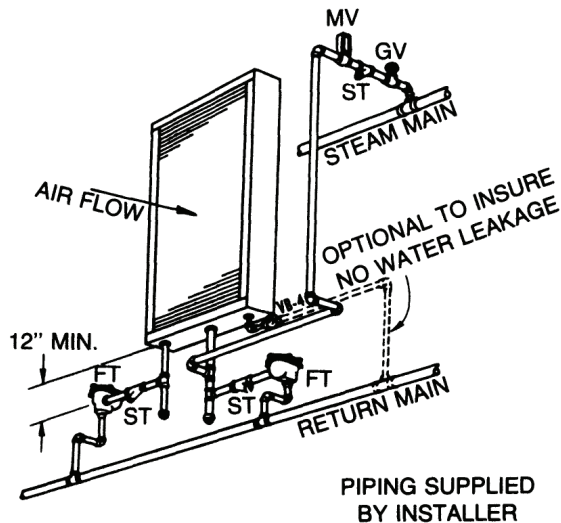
Typical piping for type A or N steam coils, horizontal tubes for horizontal airflow
